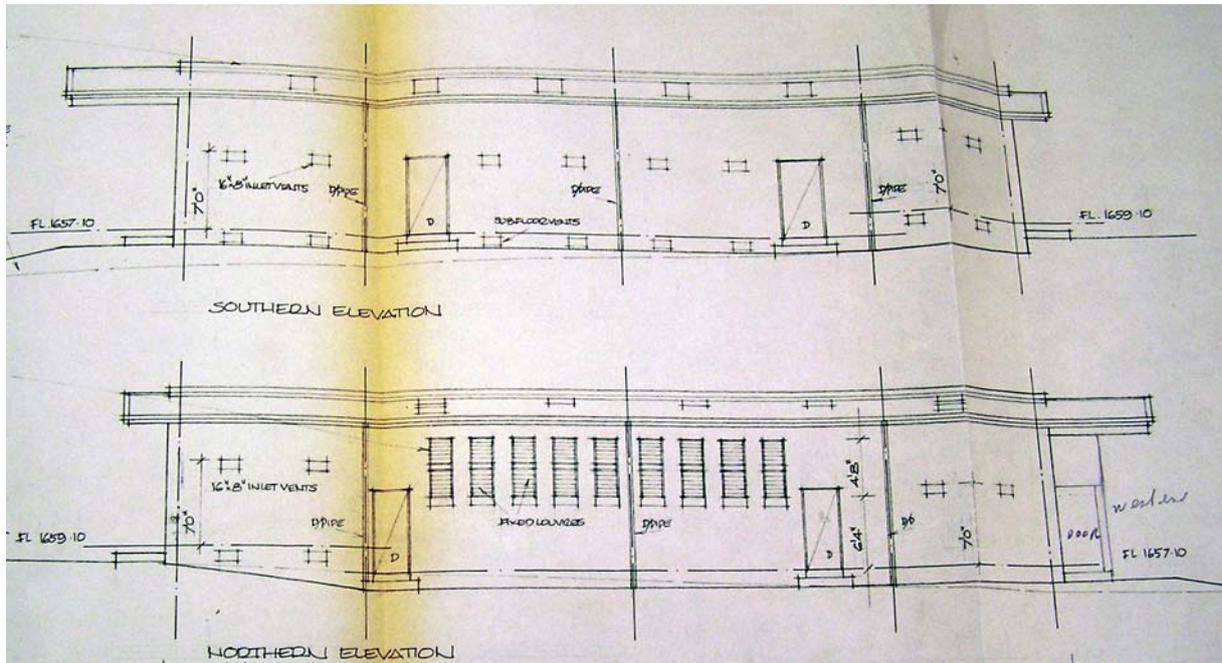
Brian F. Spears & Associates, South and North Elevation Drawings of Proposed Sports Pavilion, 1976.
